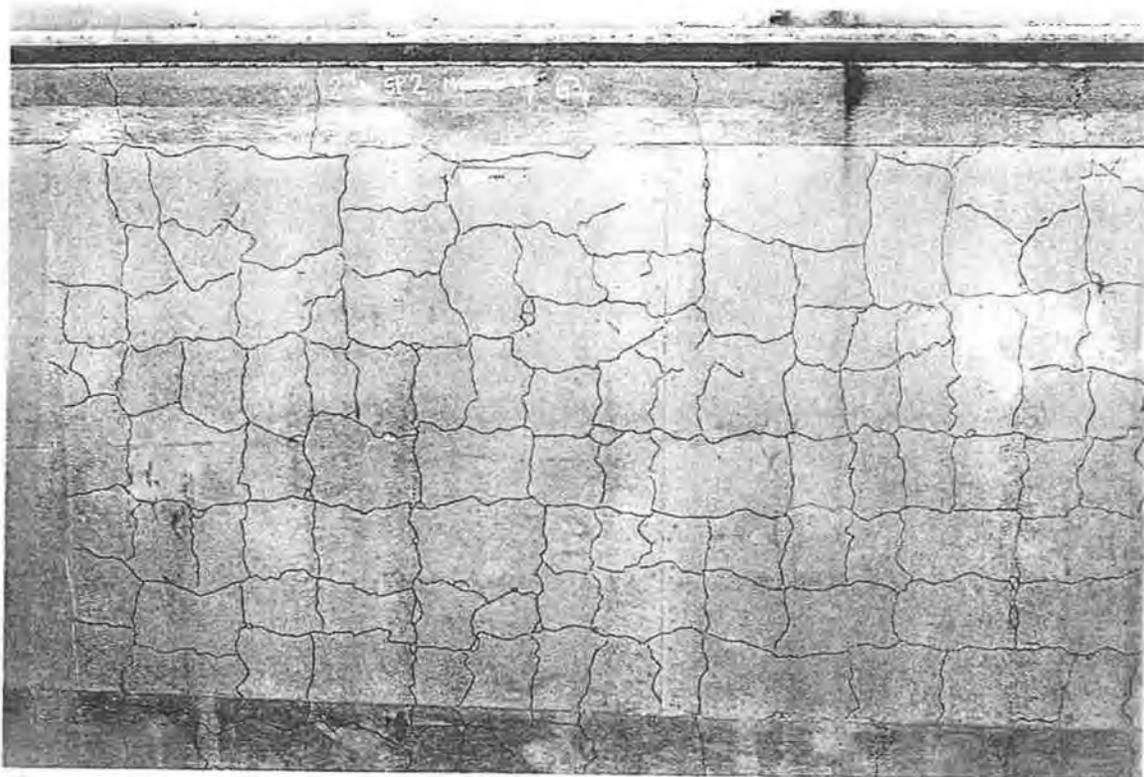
Close-up of Underside of I-65 Bridge at Midspan with Hairline Cracks Highlighted (24)
